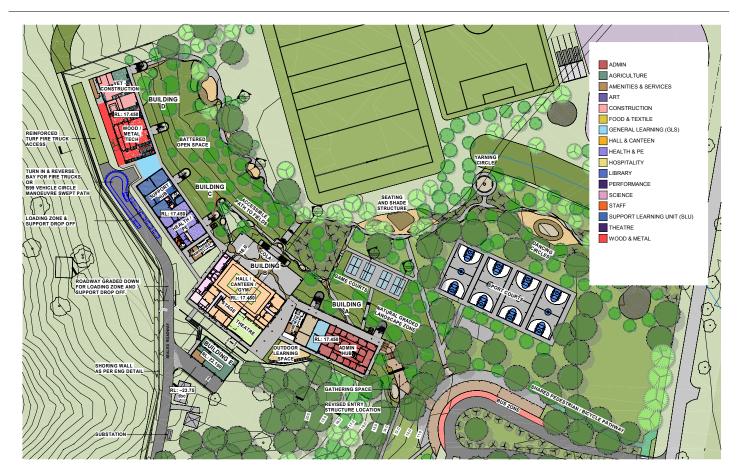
Overall Ground Floor Plan. Source: EJE Architects, 2025.
